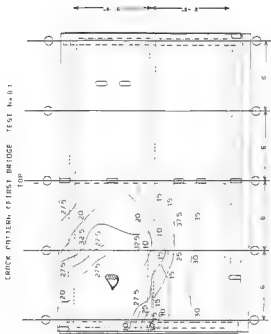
Top Cracking Pattern (First Bridge - Test No 8)
